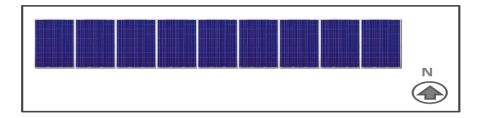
Top View of Panels on Back Building (Drawn by author)
